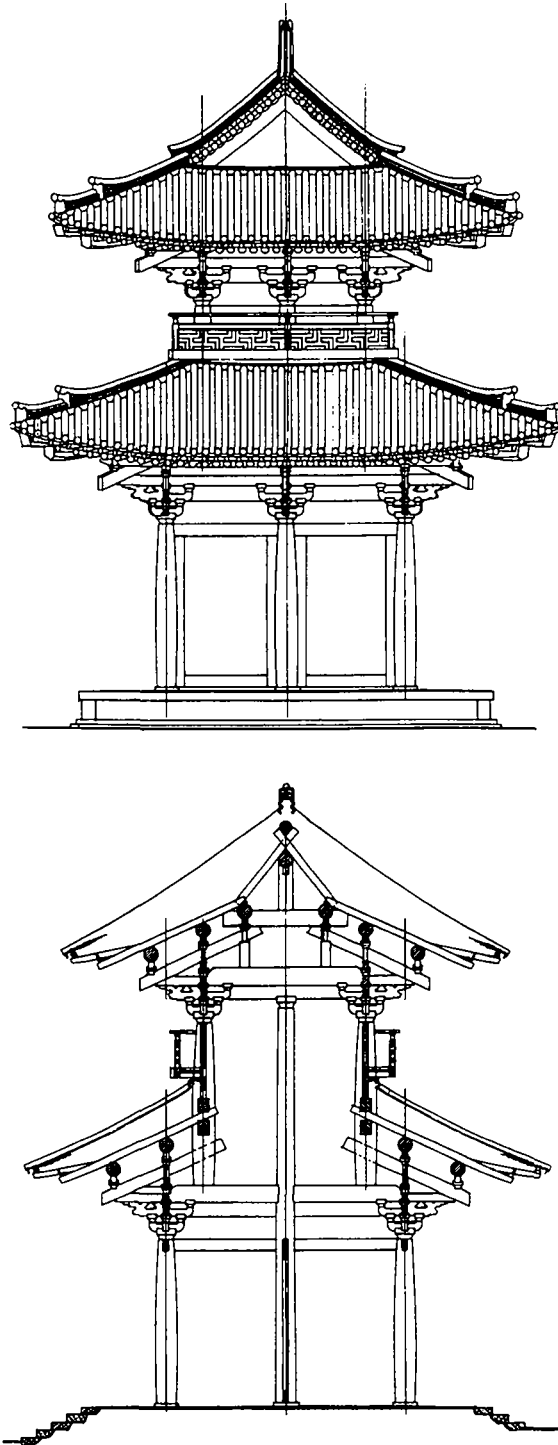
Reconstructed lateral elevation and section of the middle gate of Güm-gang-sa
